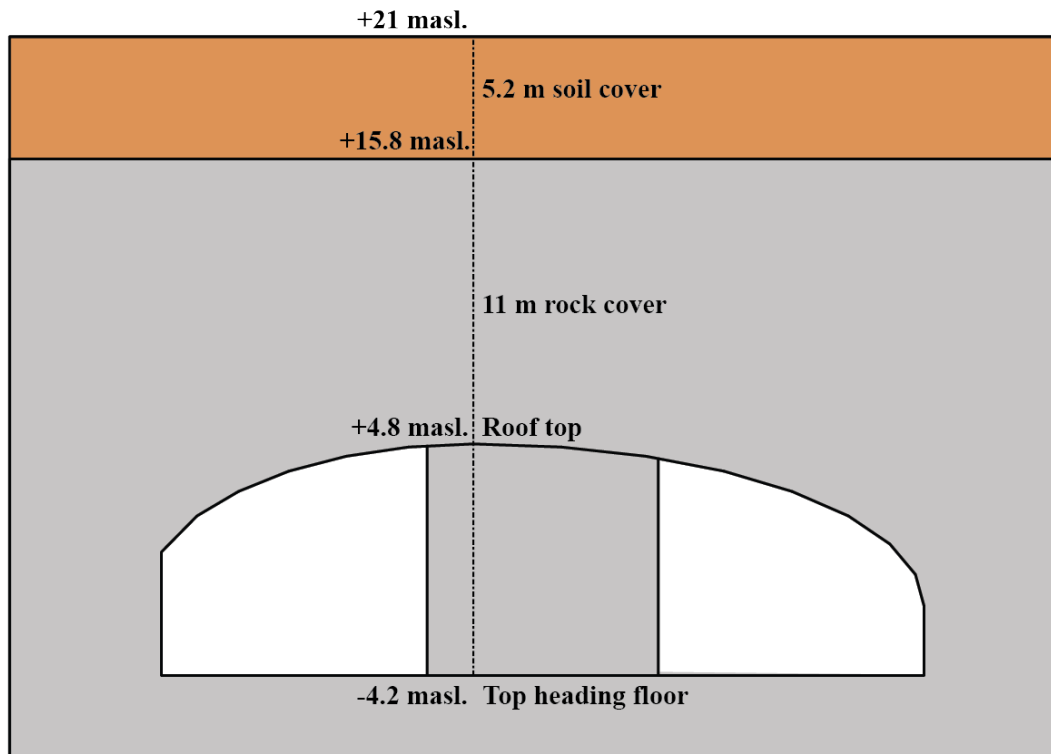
Elevations at top heading floor, roof top, mean rock surface level and mean soil surface level. The grey area depicts rock mass and the brown area depicts soil.
